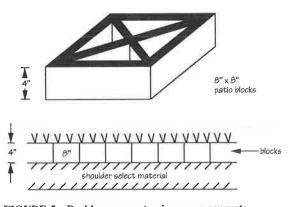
Parking support using open concrete blocks: *top*, system to allow turf to grow in swale and to bear load of parked vehicles using open concrete patio blocks; *bottom*, open concrete blocks filled with sandy soil.
